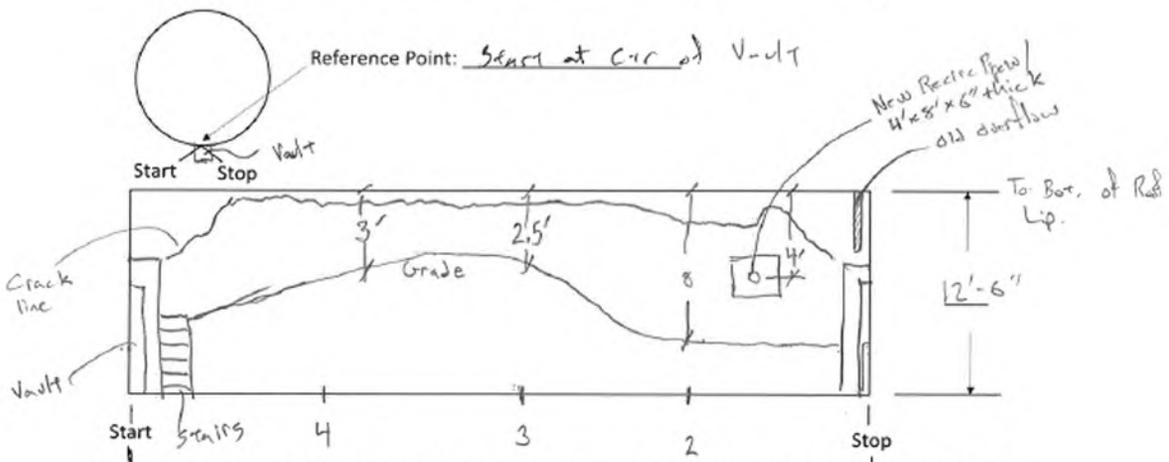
Reservoir EXTERIOR WALL Elevation– Note location of ladders and other features.
